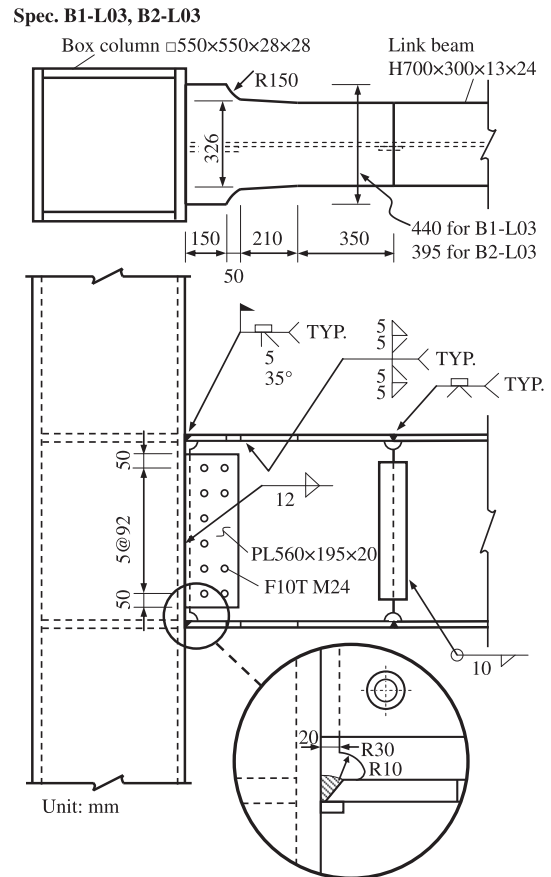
Connection details of specimens B1-L03 and B2-L03.
